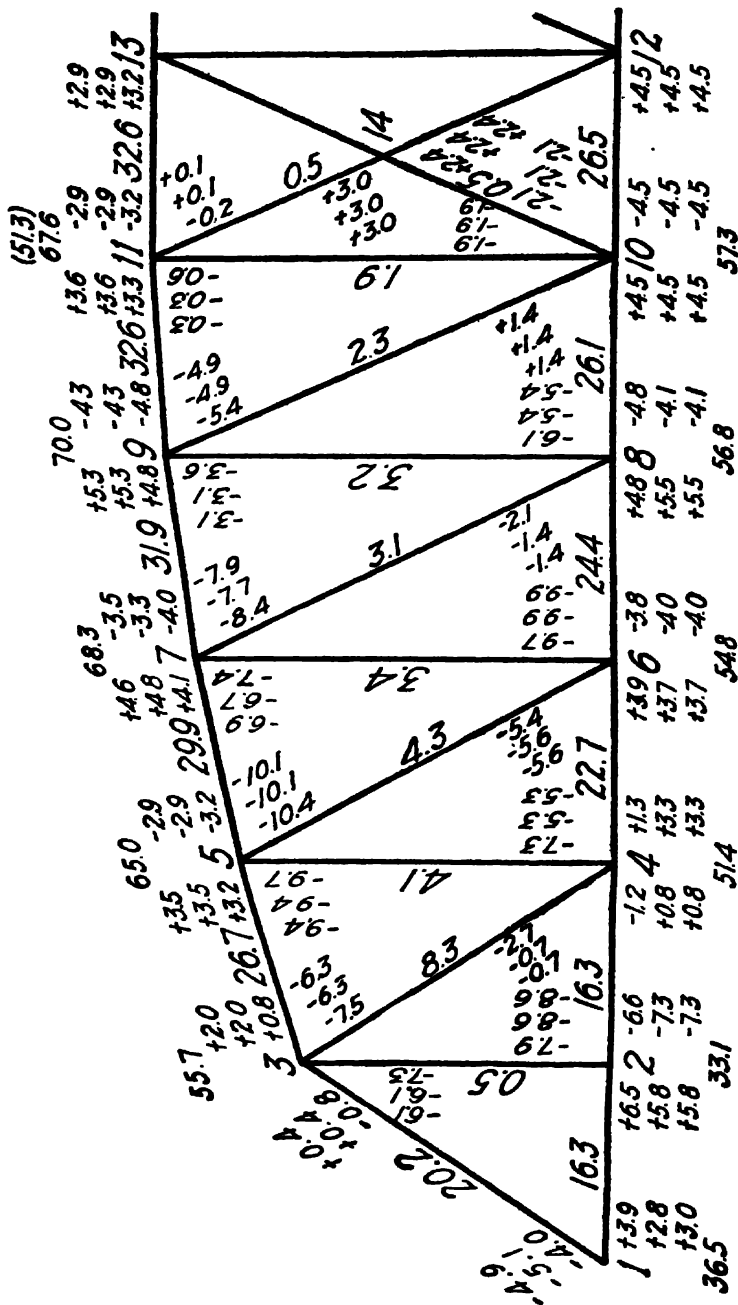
Trial Values of  $T$ 's for a 296-foot, Single-track-railway, Riveted, Parker-truss Span.
